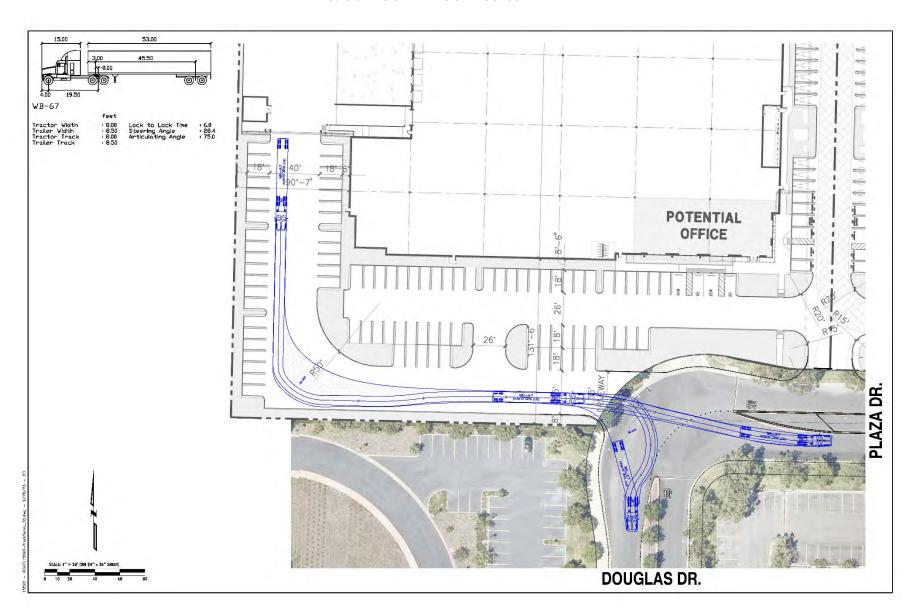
INBOUND TRUCK ACCESS AT DRIVEWAY 2
